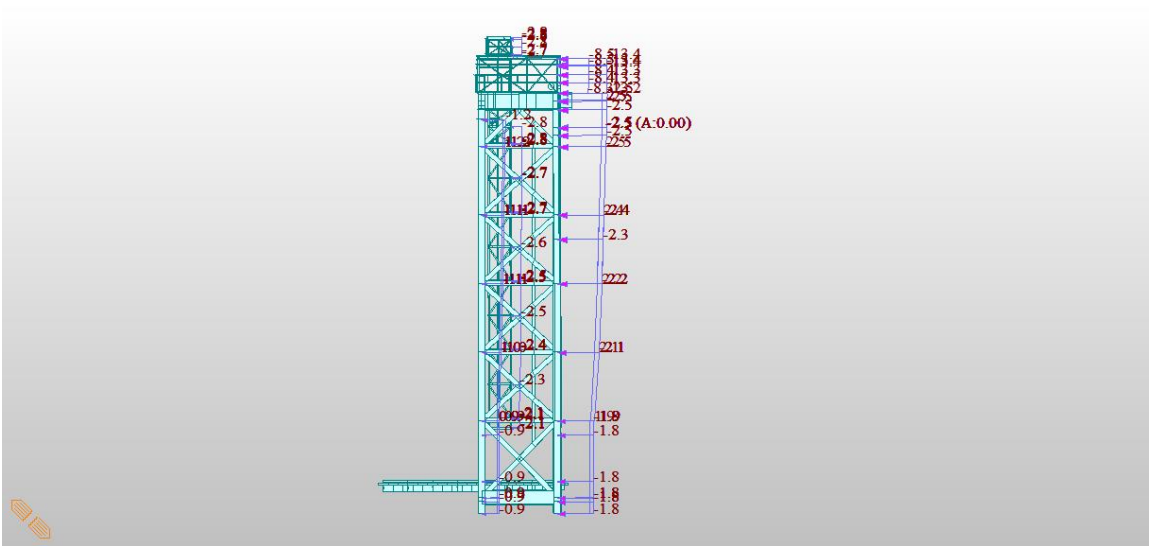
Wind Load Longitudinal 2 (North to South) – Tower
